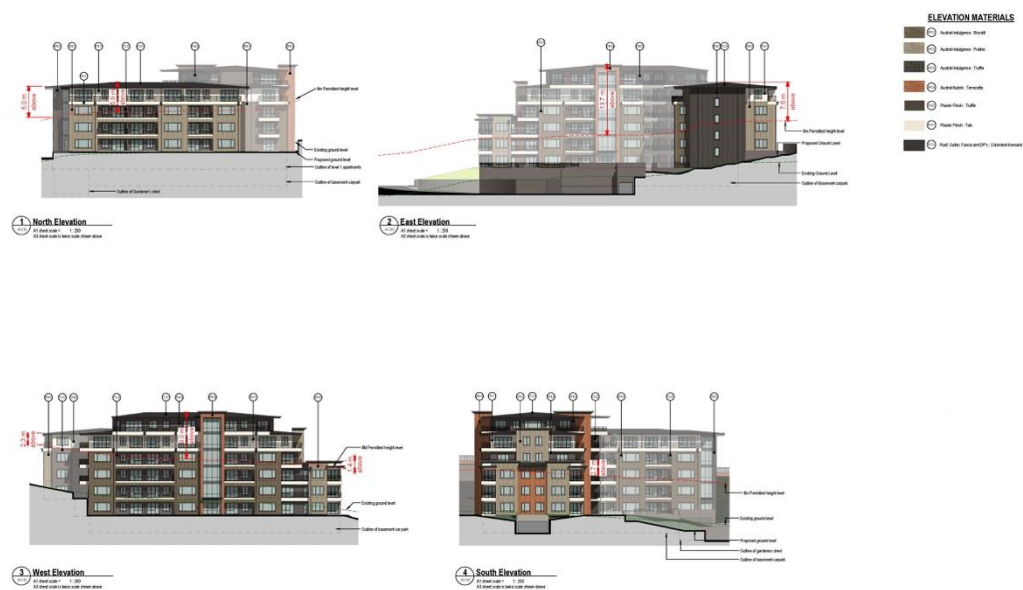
From top left to bottom right: the north, east, west and south elevations of Building B02 (Ryman Drawing A2-010 RC19).
